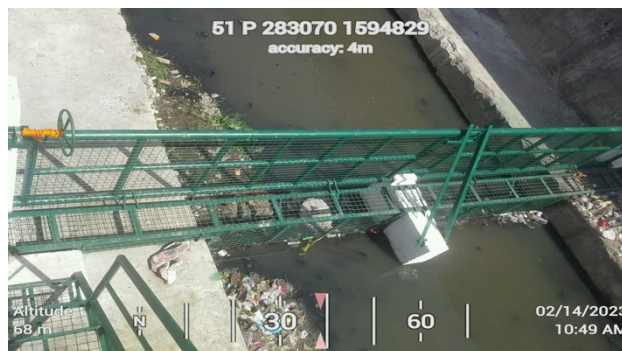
The Actual photo of the Collapsible-typed Trash Trap installed in Brgy. San Nicholas III, Bacoor City, Cavite.
